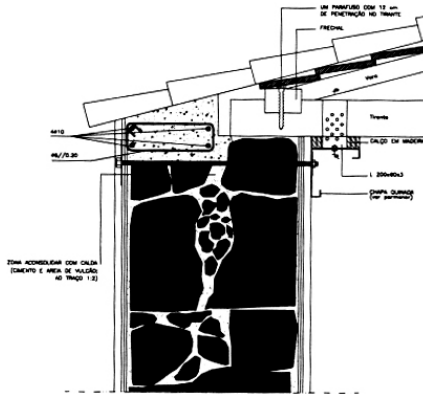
Reinforcement of the connections between roof and masonry walls by a concrete beam (Costa et al, 2001)
